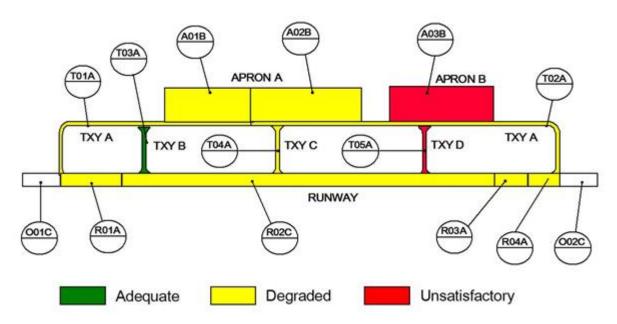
Sample Airfield Layout Plan Rated by Branch.
